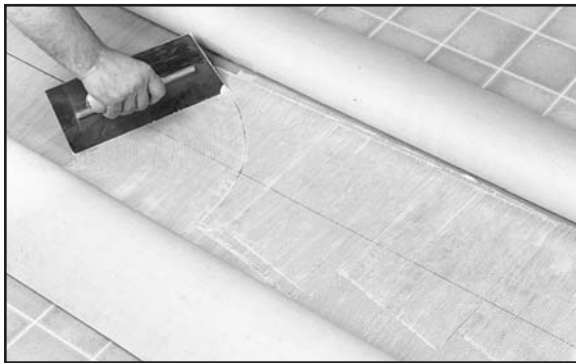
Apply adhesive to the subfloor in the dry zone with a fine notched adhesive trowel.
